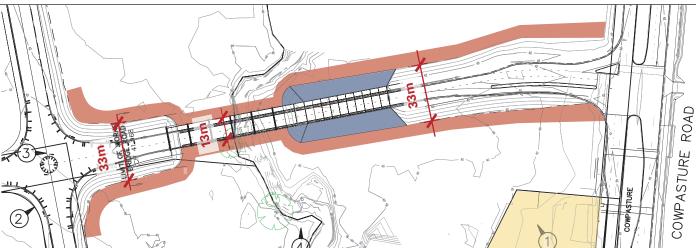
Proposed road between Hoxton Park Airport development and Cowpasture Road (Base drawing source: ADW Johnson) NTS
